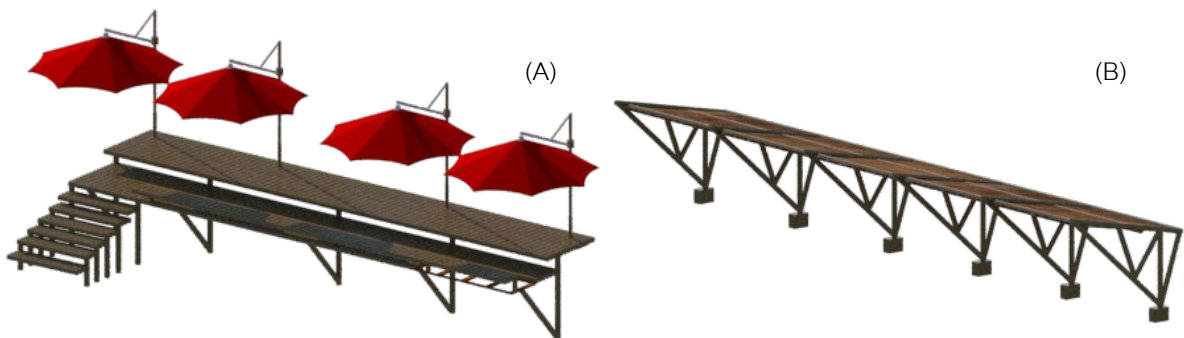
Perspective design of the renovated pavilion (A); Garage roof design after renovation (B)
